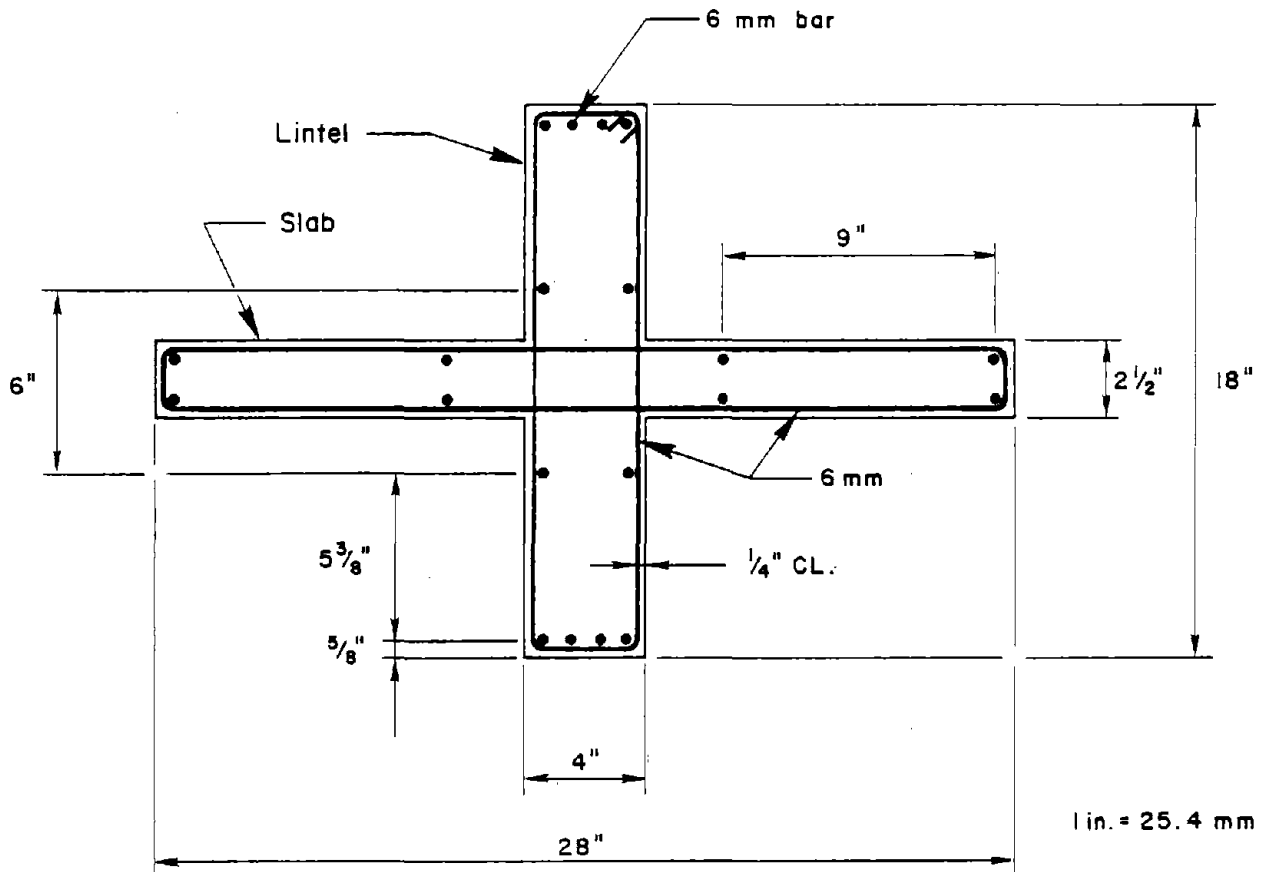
Reinforcement Details Around Openings in Specimen PW-1
